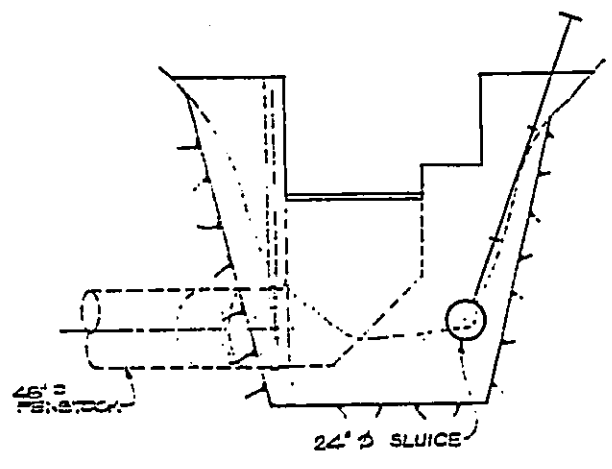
The engineering details of the diversion structure at the Hanalei Tunnel outlet.
